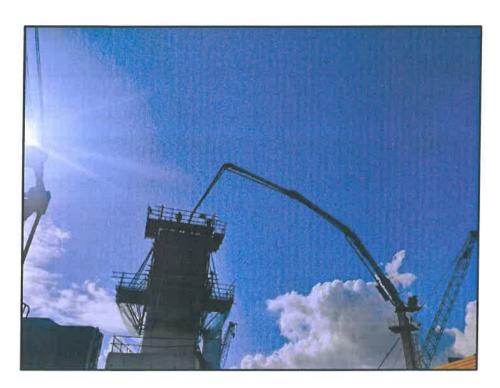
Pier 1st lift concrete at MP 174 RHS in progress
